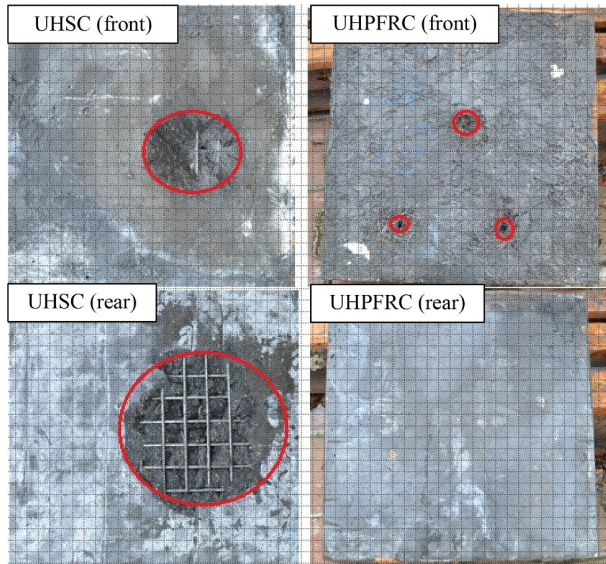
Front and rear surfaces of UHSC (left) and UHPFRC (right) plates after projectile impact tests.
